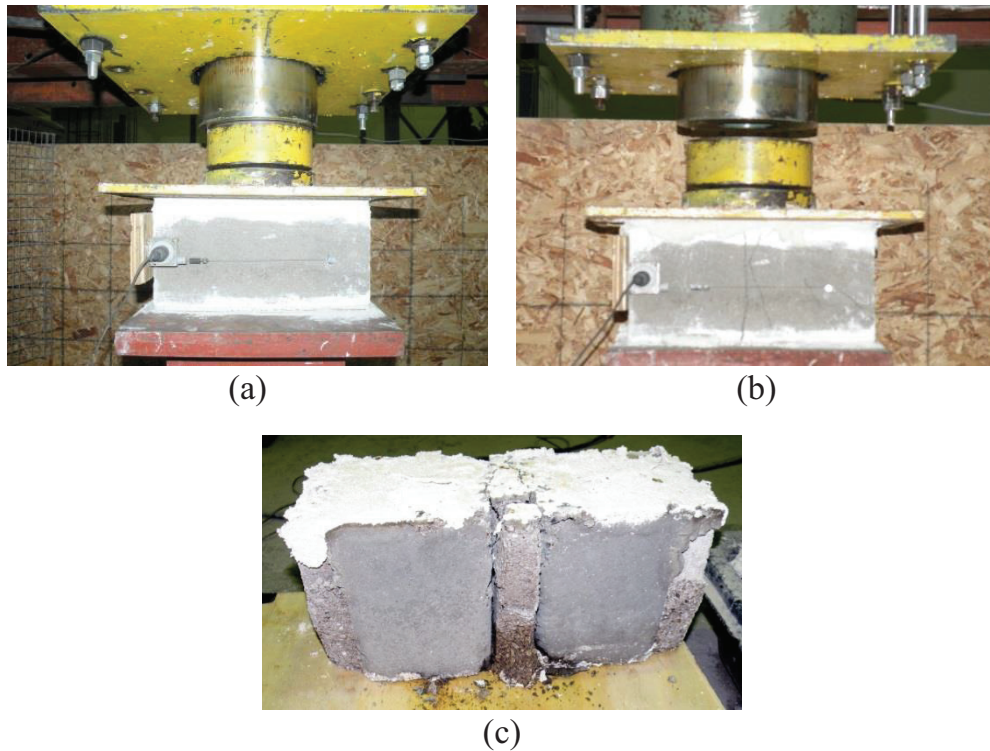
Uniaxial compression test for grouted concrete masonry unit: (a) prior to failure; (b) initiation of cracks; (c) after failure
